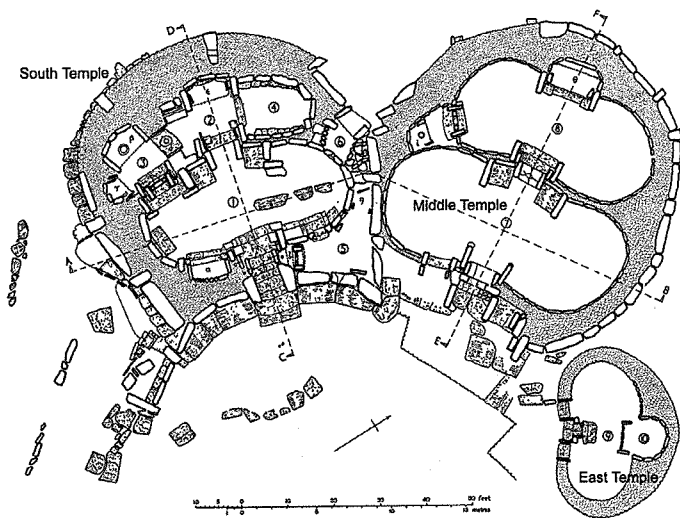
Plan of Mnajdra Temples. (After Evans, 1971)
